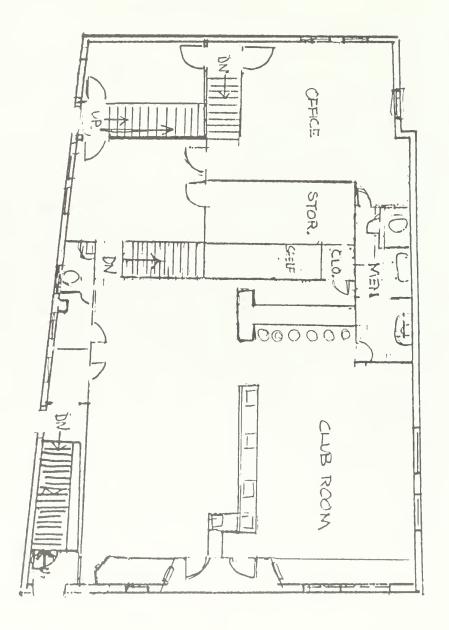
Polish Club building: conjectural first-floor plan, 1960s.
